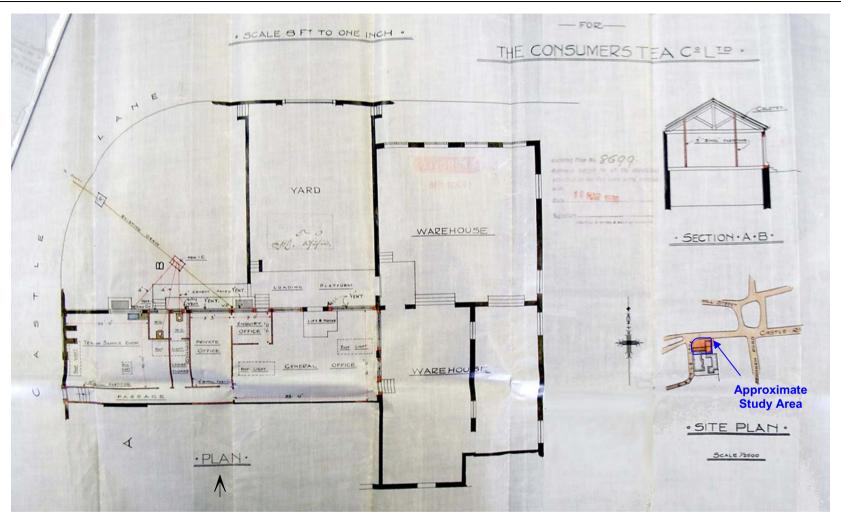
Building plan: bottling store extension, 1926 (Not to scale)
